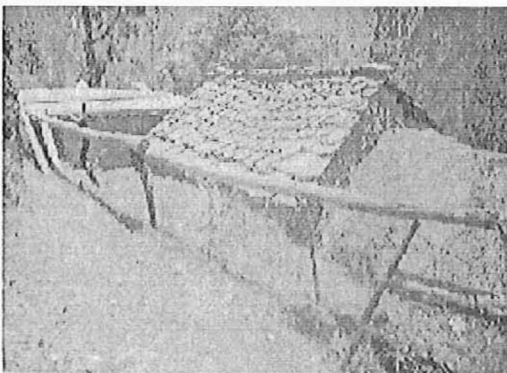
Mixed roofs (RCC, Slate and Thatch)
